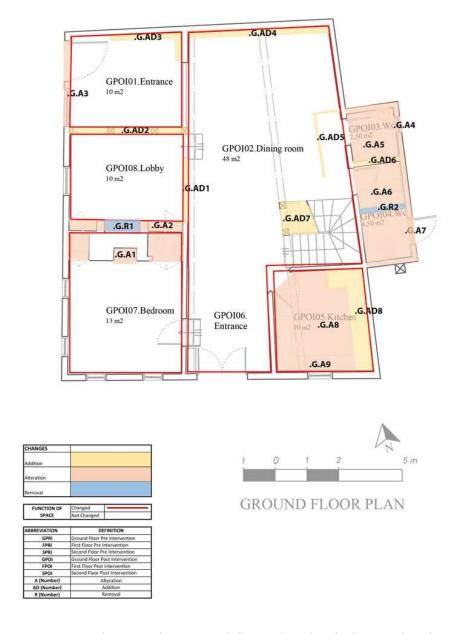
Post-intervention ground floor plan that indicates the changes during the hotel transformation (Author, 2023)
